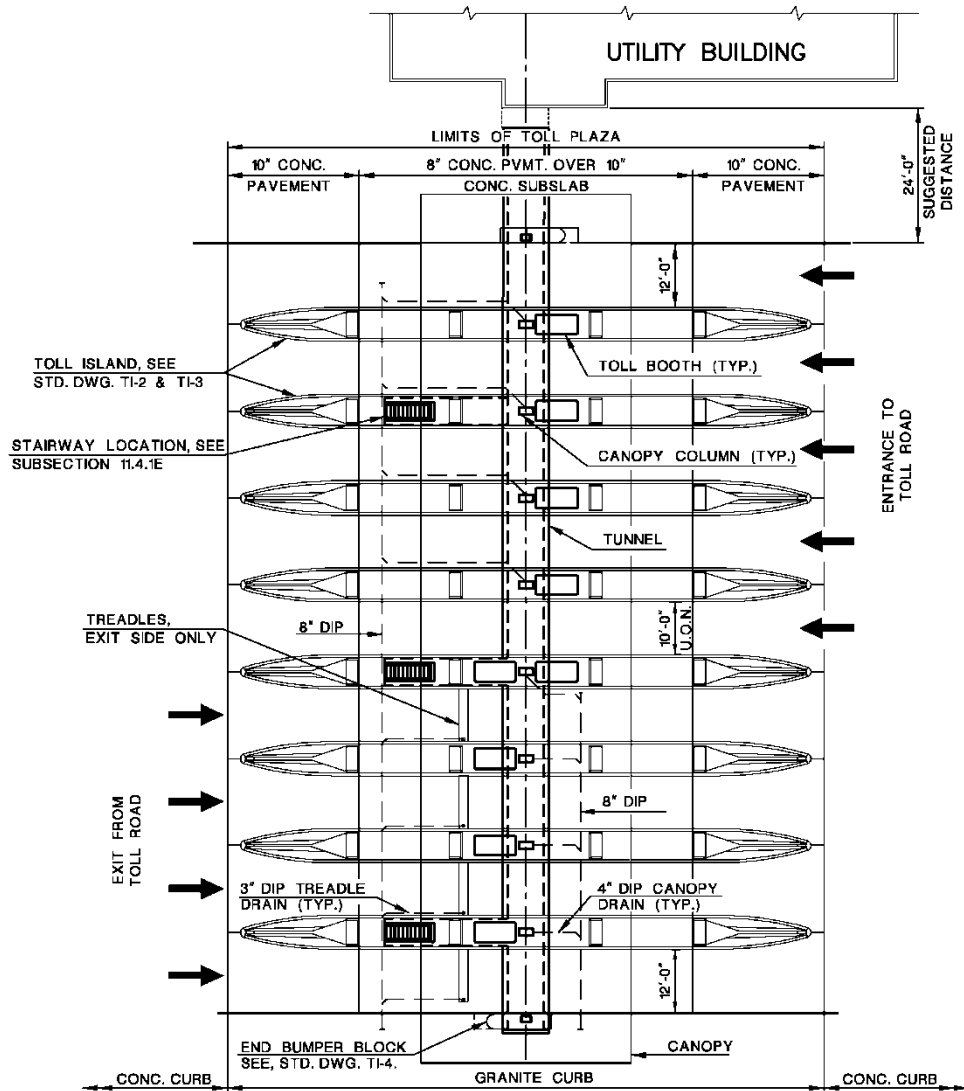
4 TWO WAY TOLL PLAZA LAYOUT
